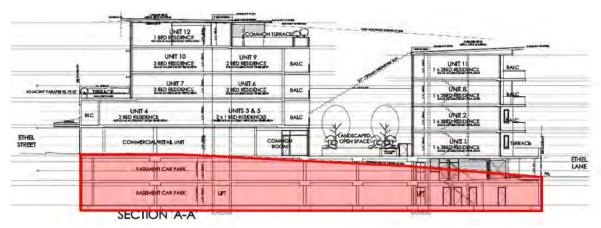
Extract from the Section A-A plan showing the extent of excavation proposed to enable the construction of the basement levels (shaded in red).
